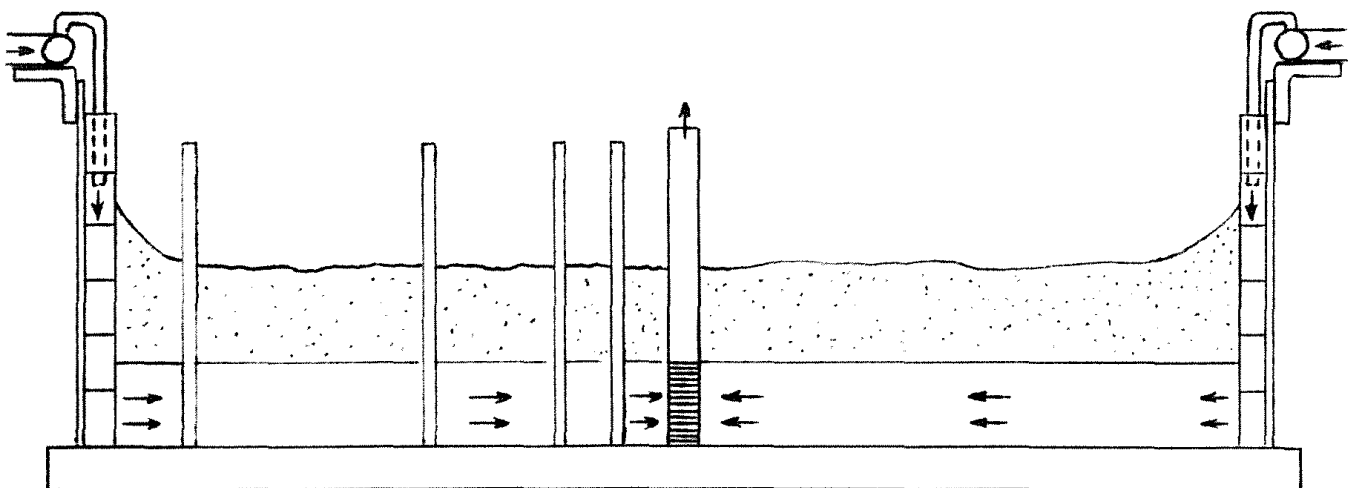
SECTION SHOWING PATH OF WATER THROUGH MODEL
